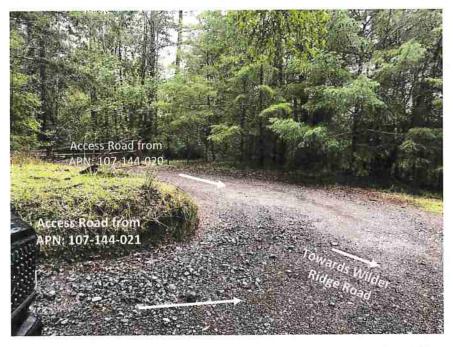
Intersection of two private access roads leading from Wilder Ridge Road. Phot taken facing south-west.
